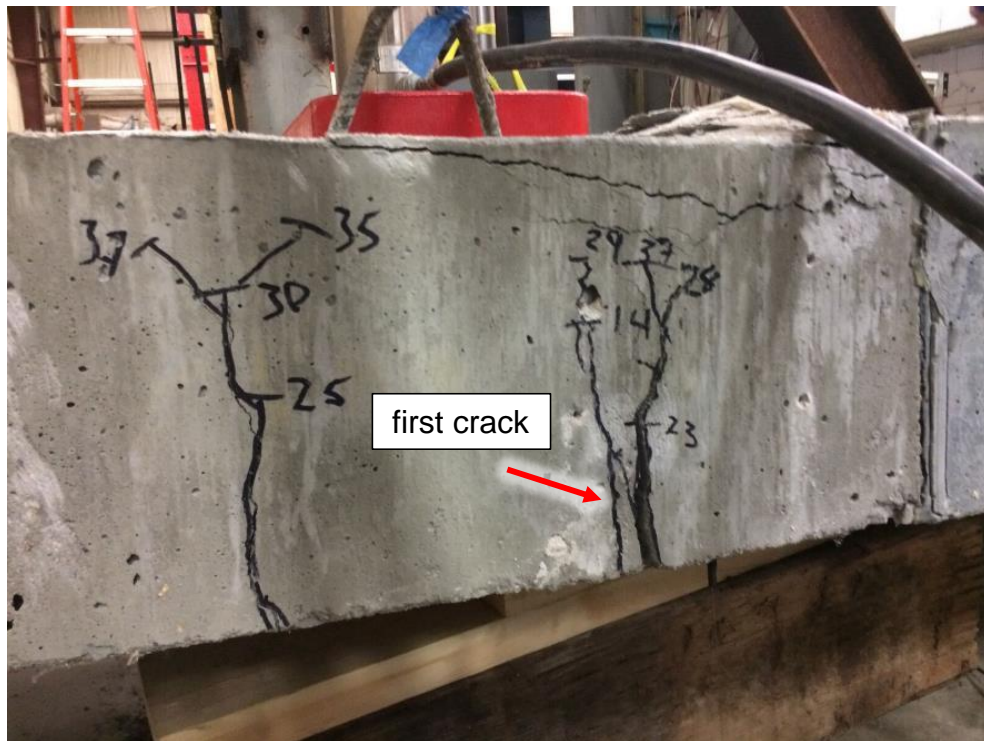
Cracking underneath load on north side of slab 2 and crushing of concrete near load point
